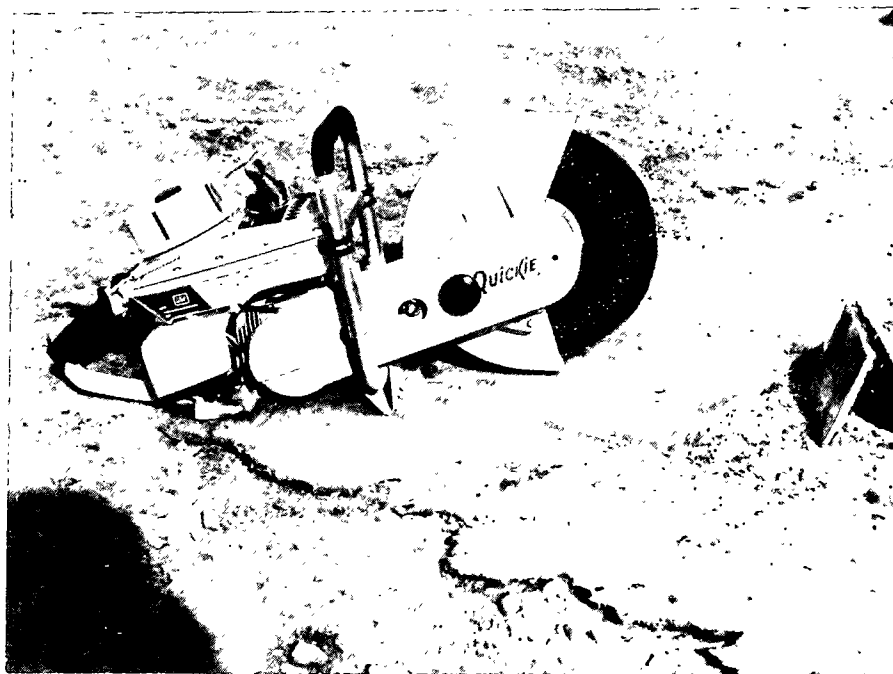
ON-FAST can be removed either by using a mobile power saw equipped with an extra-reinforced high speed abrasive blade to cut the surface material into pieces convenient to handle and haul away, or the material can be broken up by a tractor equipped with metal belts with cleats. (Official US Navy photograph.)
